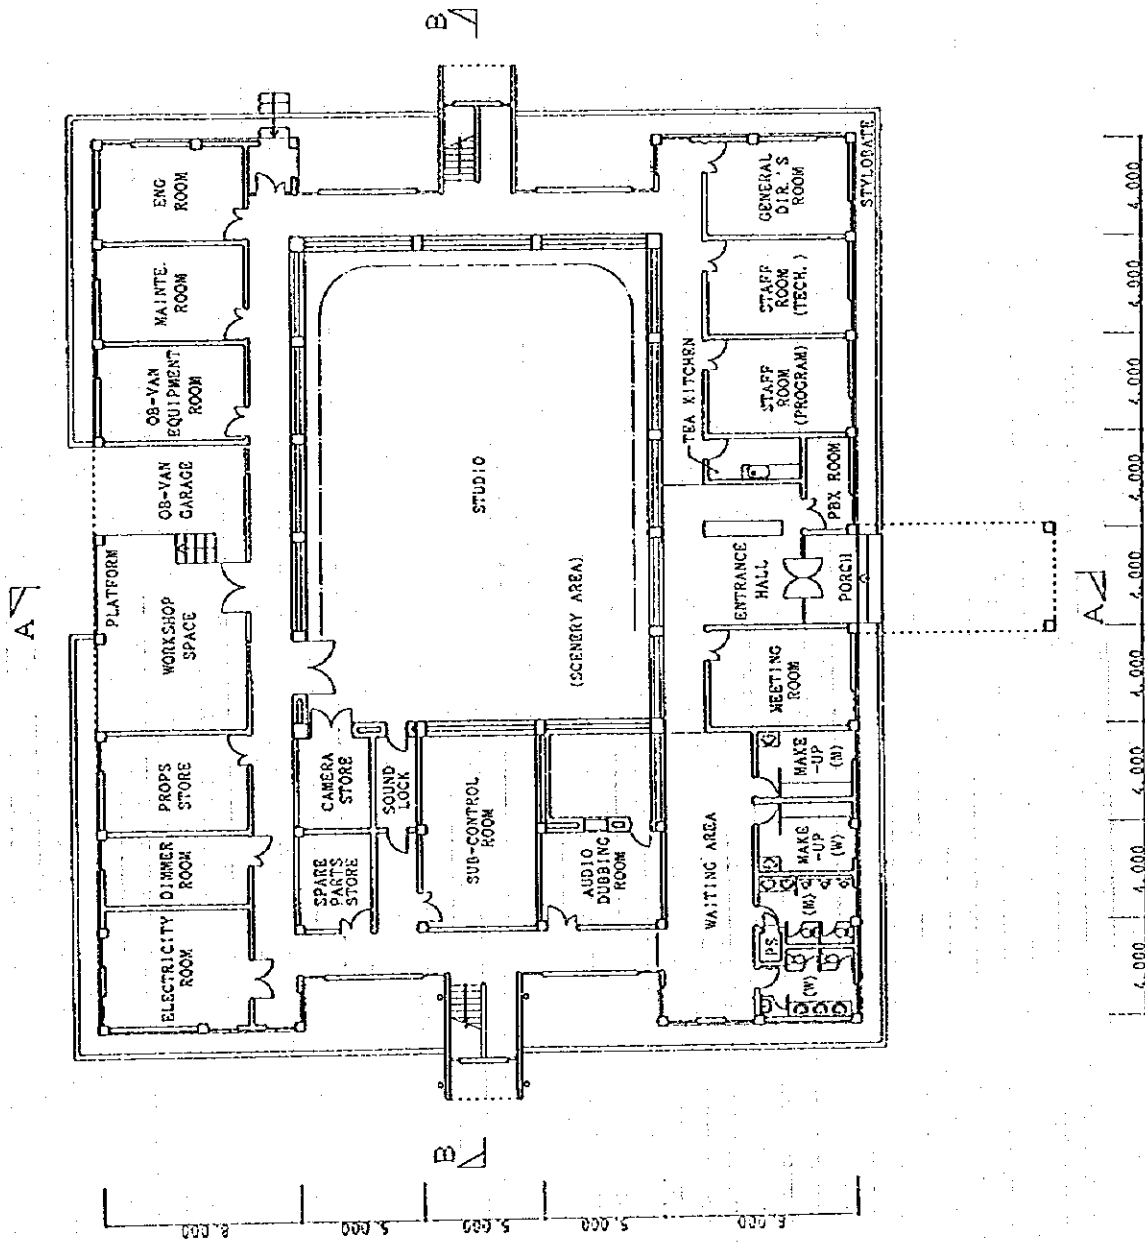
PHNOM PENH TV STATION, FLOOR PLAN (GROUND FLOOR)
